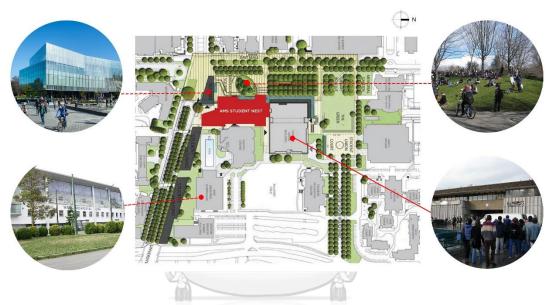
18.. location of surrounding buildings (Architects, 2017)
